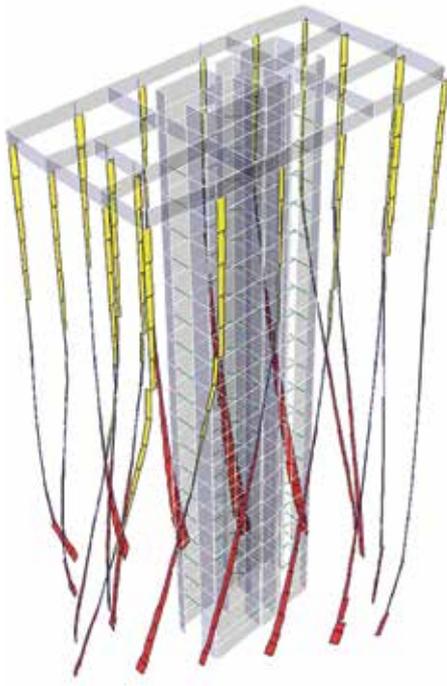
Yellow depicts the tension in the upper columns (Source: DeSimone Consulting Engineers, PLLC)
